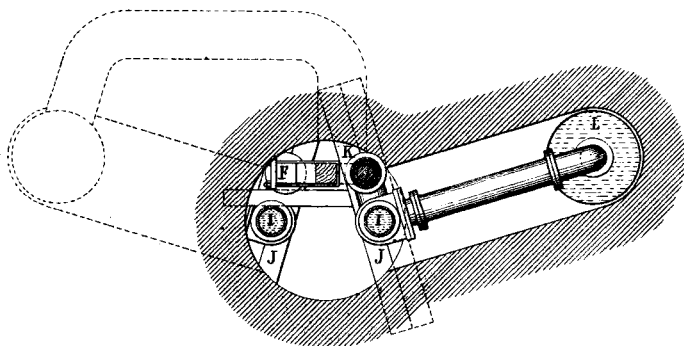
Sectional Plan of Pit at Lower Plunger Pump.
